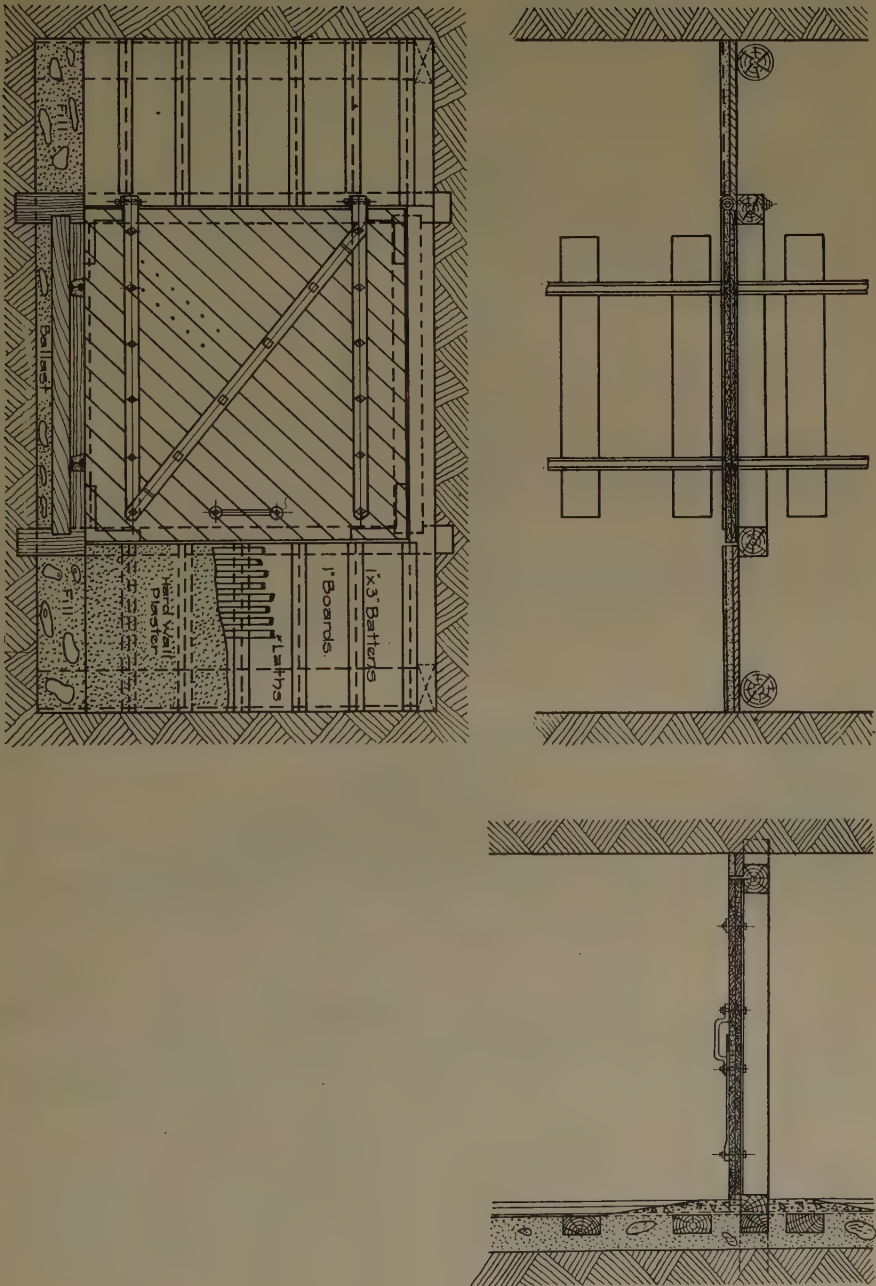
TYPICAL MINE DOOR. DOORS PLACED WHERE THE PRESSURE EXCEEDS 1 IN. WATER GAGE HAVE SIDES BUILT OF CONCRETE IN PLACE OF PLASTER.
